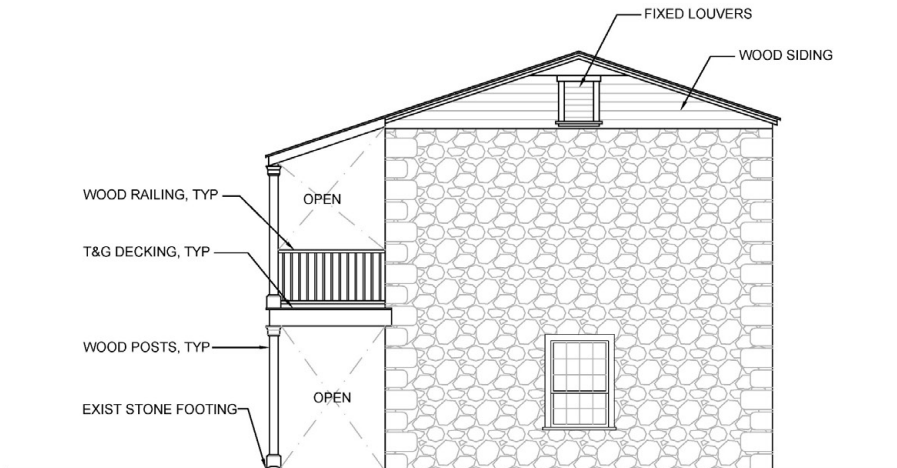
Masters' Reading Room Kā'anapali Elevation.
